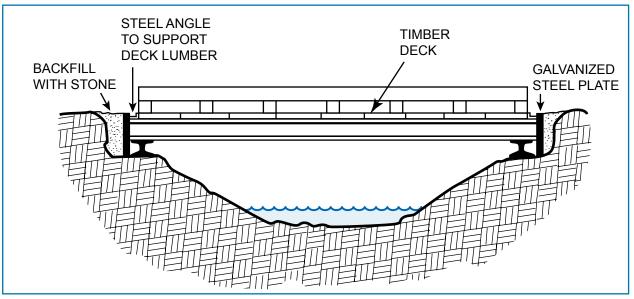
Side elevation section view of private bridge without concrete abutments
